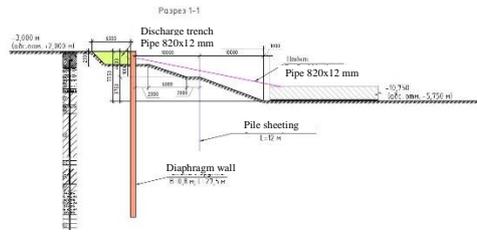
Fragment of substructure (no piles are shown) of designed multifunctional building across one of sections
